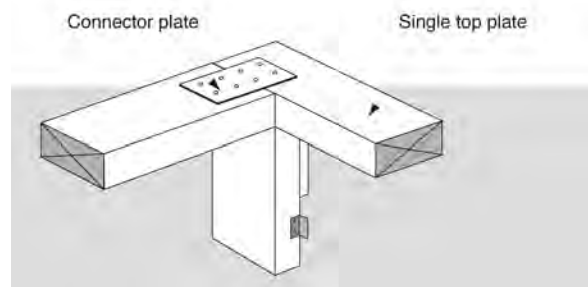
Single top plate connector detail. Note that a metal inline connector must be used. Picture adapted from Building Science Corporation.
